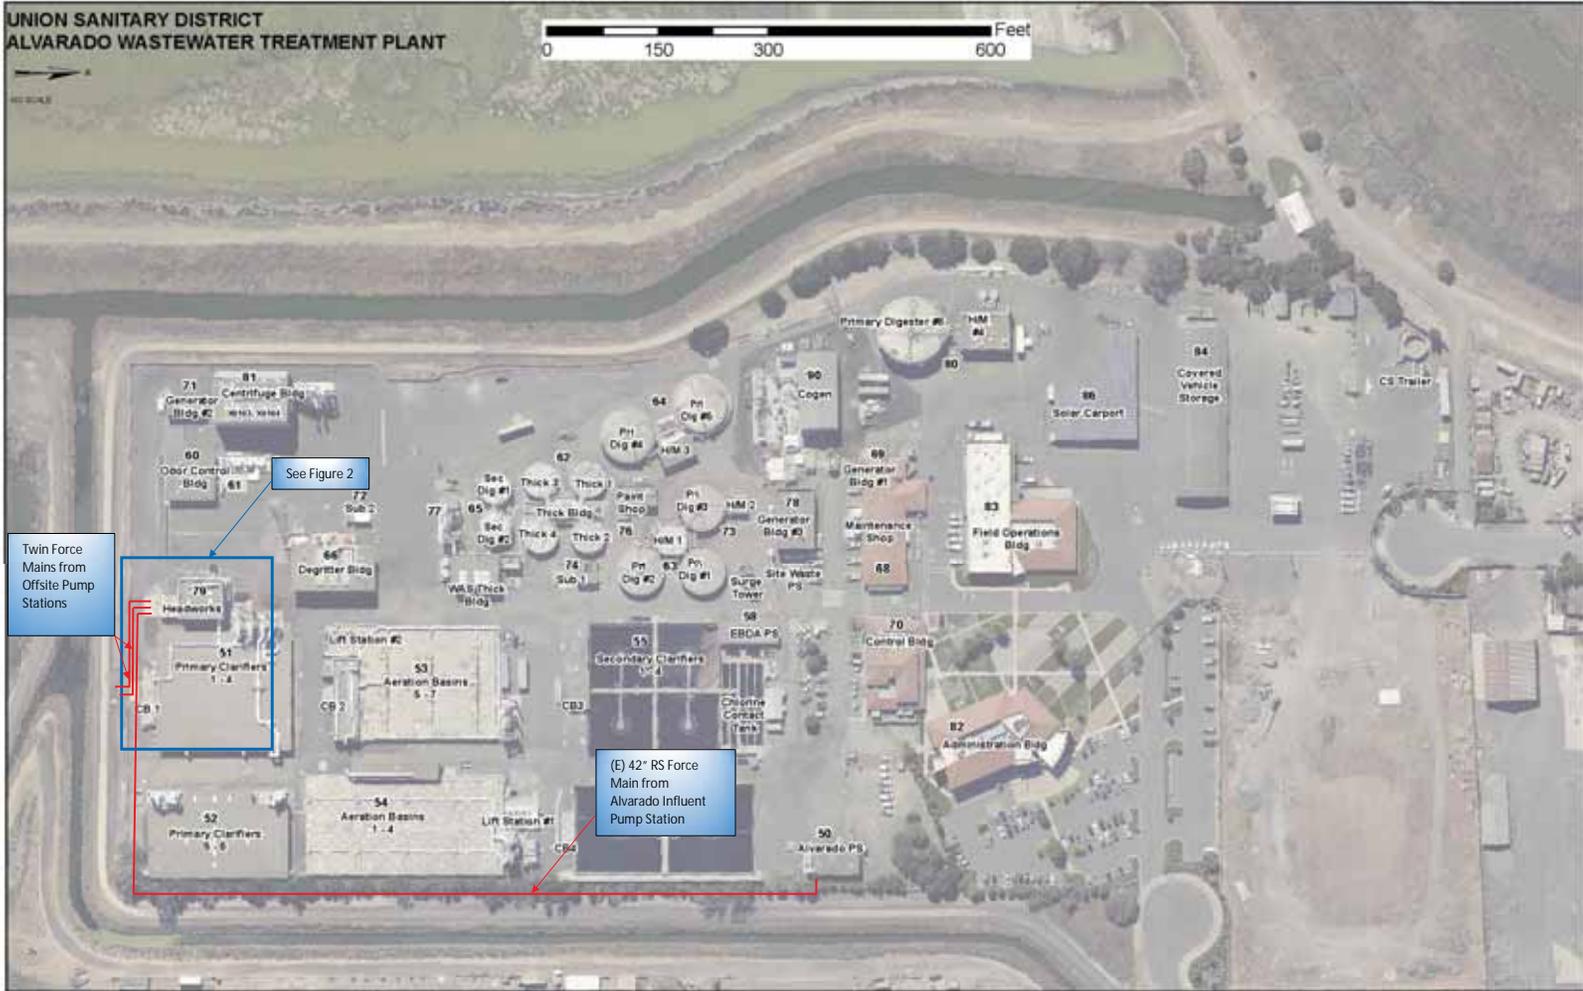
Site Plan of Existing Force Mains Connecting at the Headworks Valve Box)
